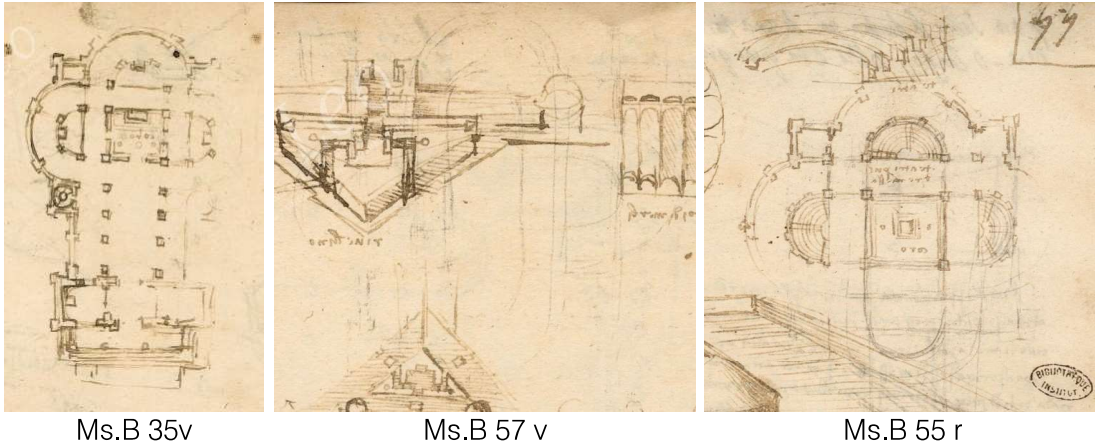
Group 3, second type: the plan is obtained by adding aisles all around the previous layout
